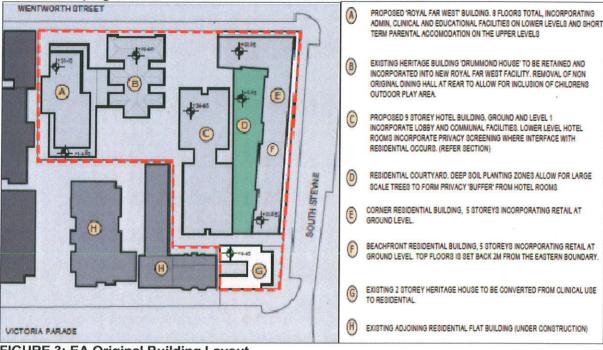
EA Original Building Layout Source: EA Documentation by Urbis, August 2011
